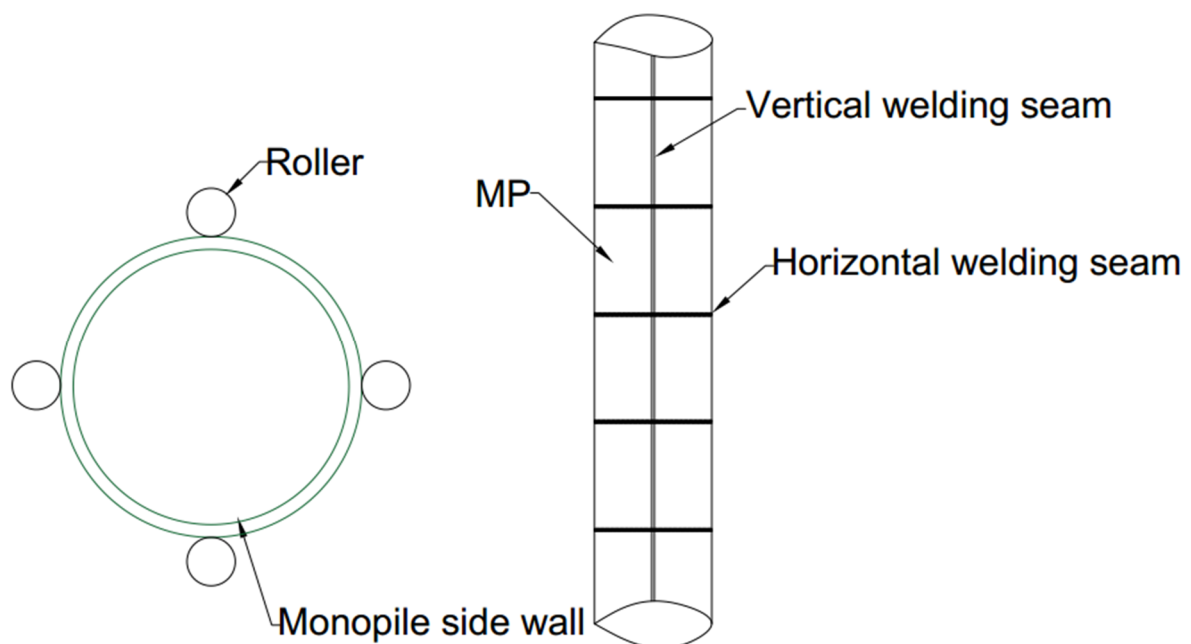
Top view of Gripper (roller) monopile system and side view of monopile with welding seam.
